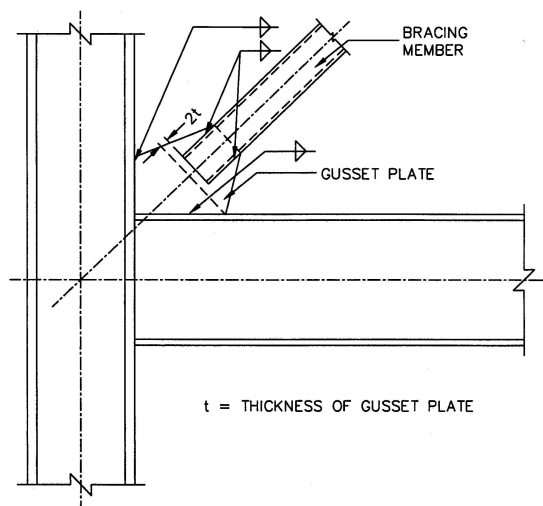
Brace-to-gusset connection detail to permit ductile out-of-plane brace buckling (AISC 1997, with permission from American Institute of Steel Construction, Chicago, Illinois)
